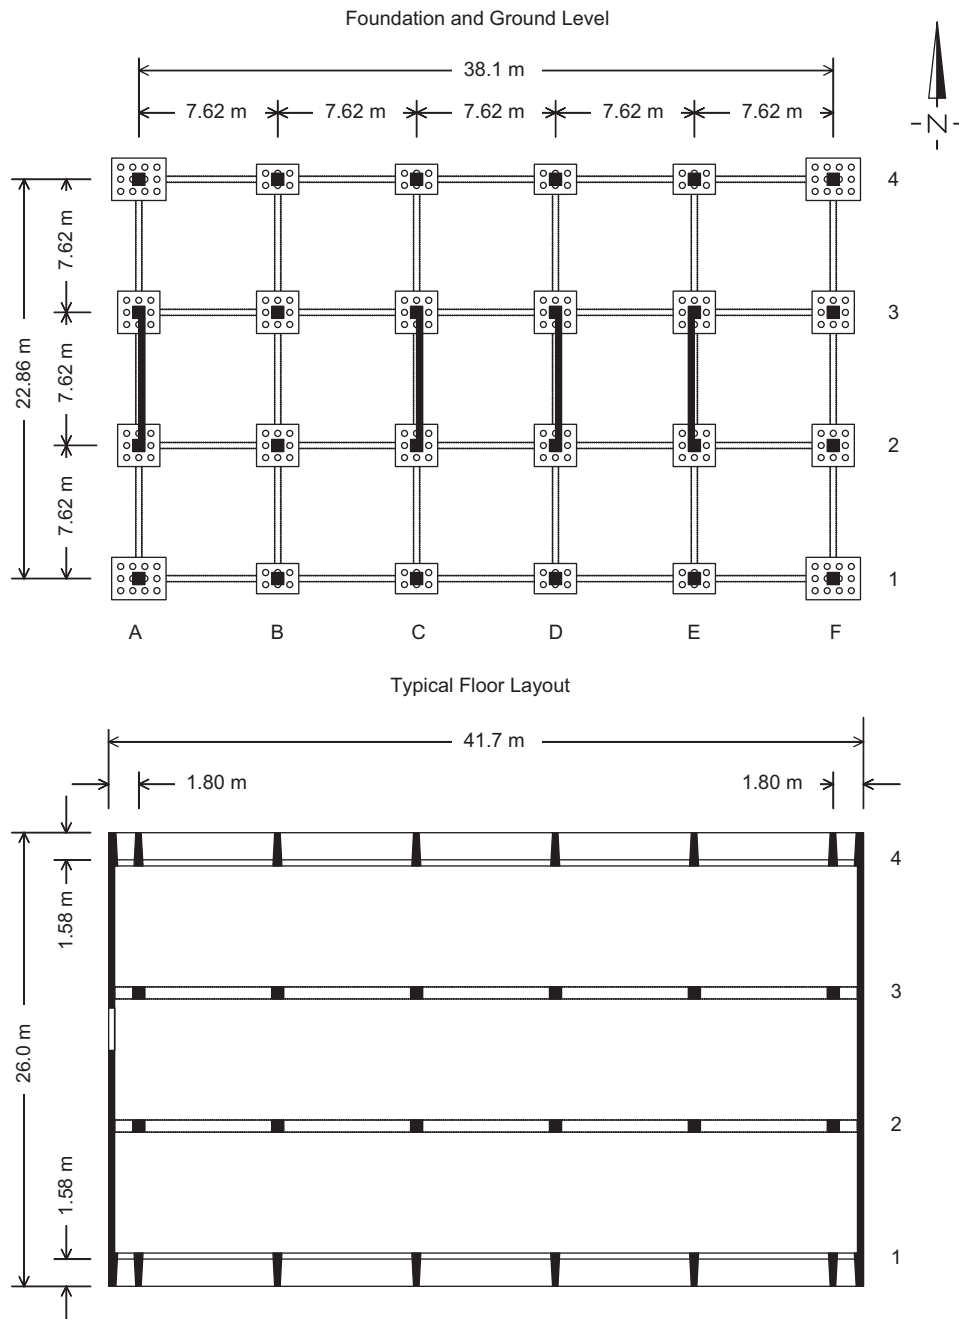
Foundation and ground level plan (top) and typical floor layout (bottom) of the ICS building.
